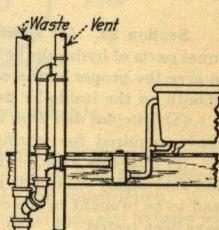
Method of connecting bath, showers, and similar fixtures.
